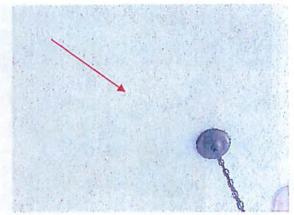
View of ceiling texture (HA-D) in various areas of the building.
